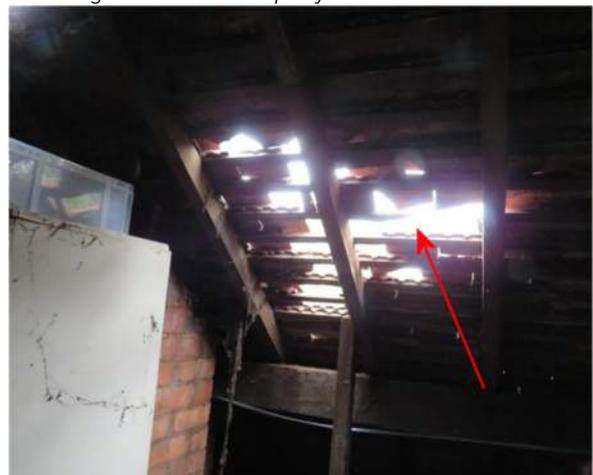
Openings on the roof of the southern side of the bungalow over the hip rafters
